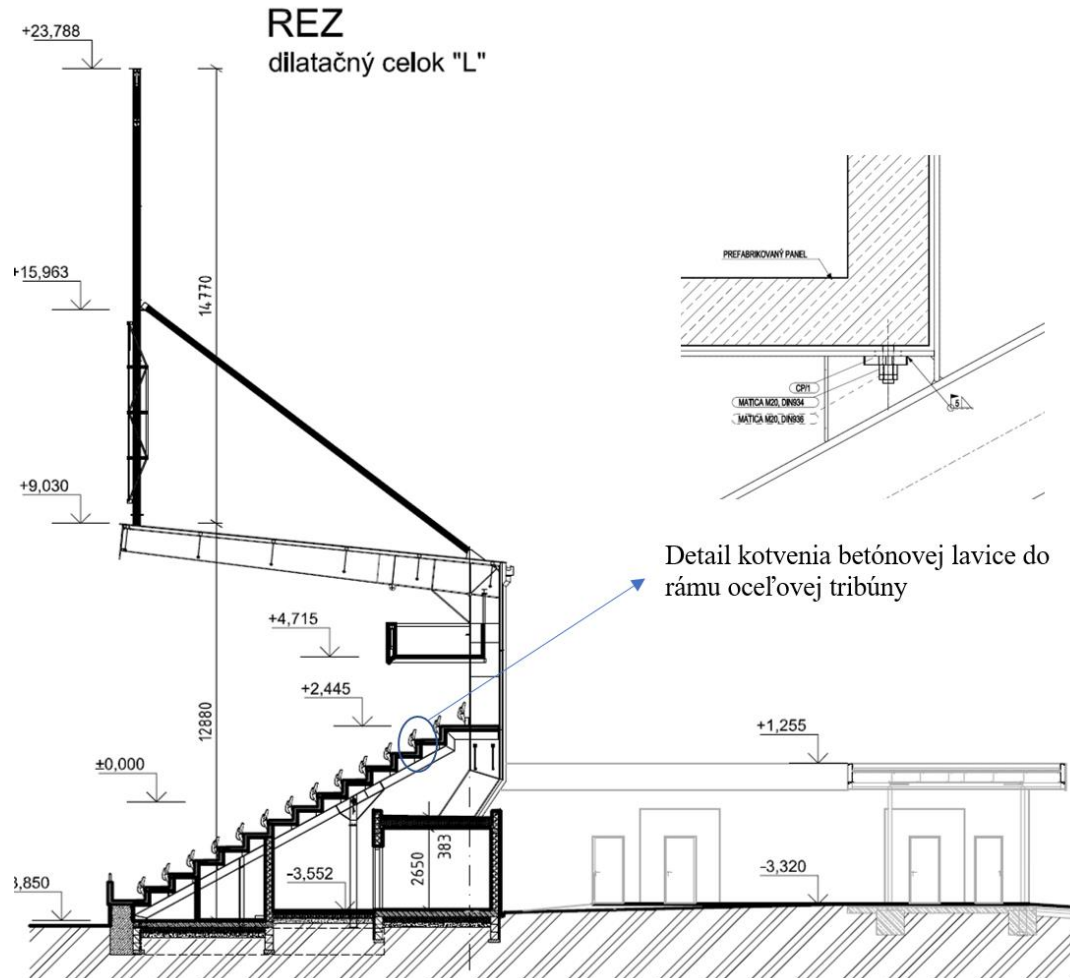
Transverse link of the combined structure of the west tribune of the City Arena in Trnava. Cross section, dilatation unit L. Prefabricated panel. Detail of the anchoring of the concrete bench to the frame of the steel tribune.
